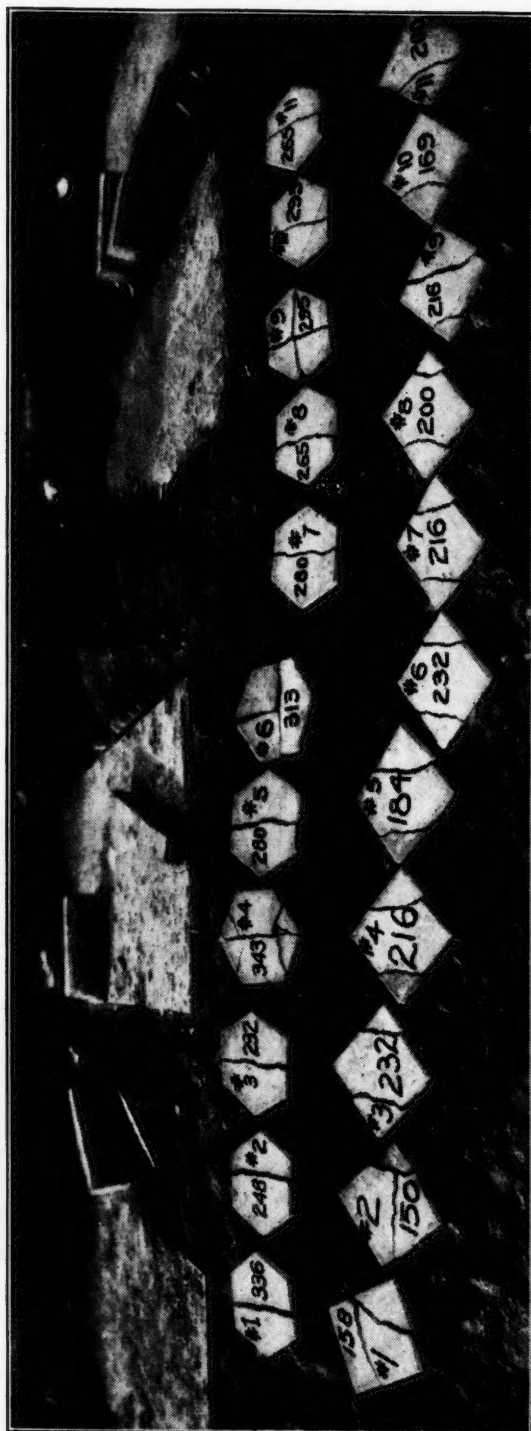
VIEW SHOWING ACTUAL BREAKS OF TEST SPECIMENS AND RELATIVE BREAKING LOADS UNDER PRIMARY LOADING.
